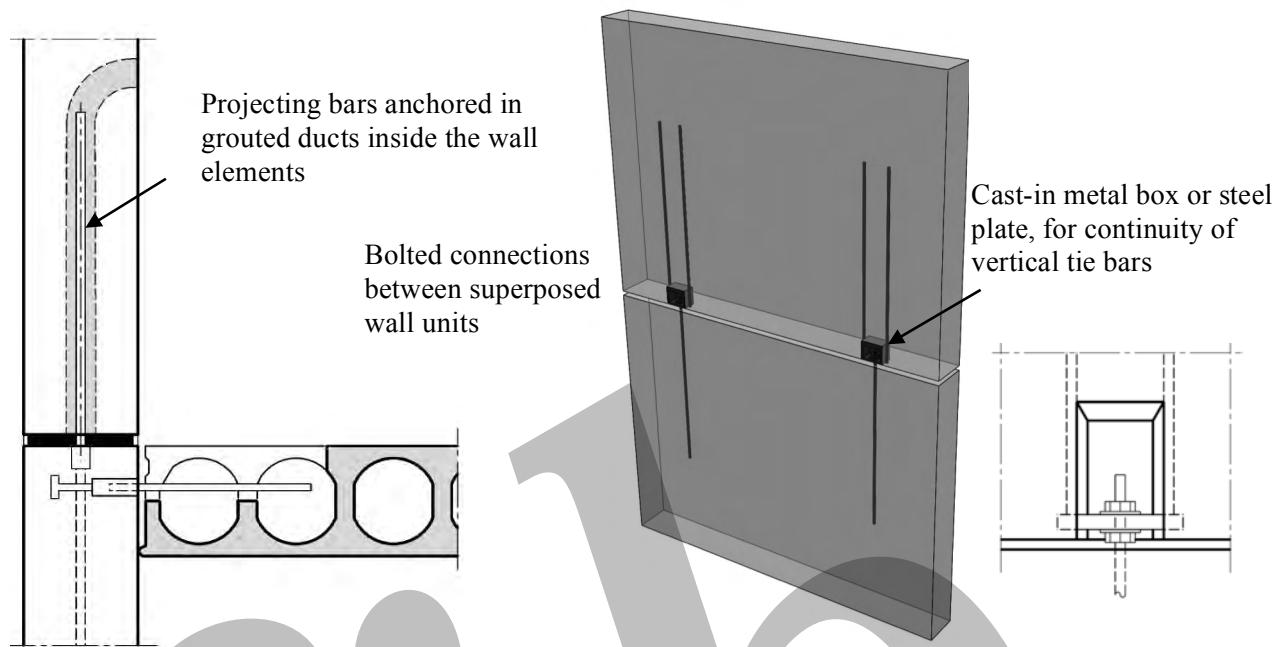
Examples of vertical wall-to-wall connections for low tensile forces
